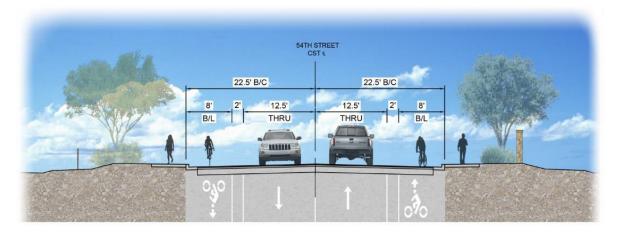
54th Street Typical Section - Segment H4 Standard Bike Lanes/No Parking
